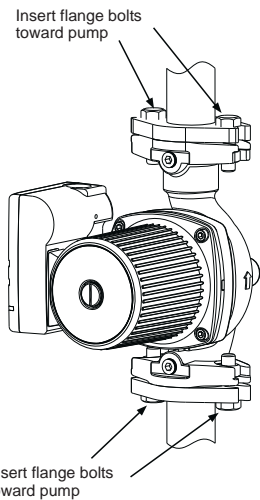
Connect pump to piping, installing flange bolts toward the pump
